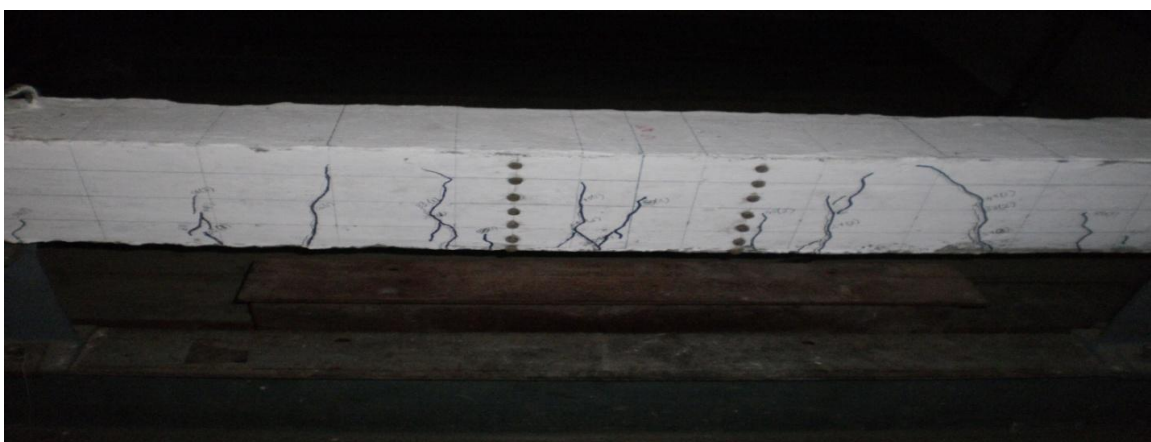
Crack Pattern of R₃ Beam under Flexure
